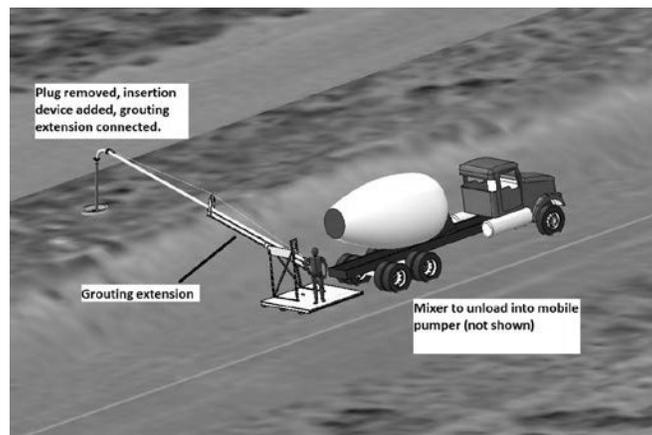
Rendering of Grout Extension Boom Shown Next to Tunnel 2
